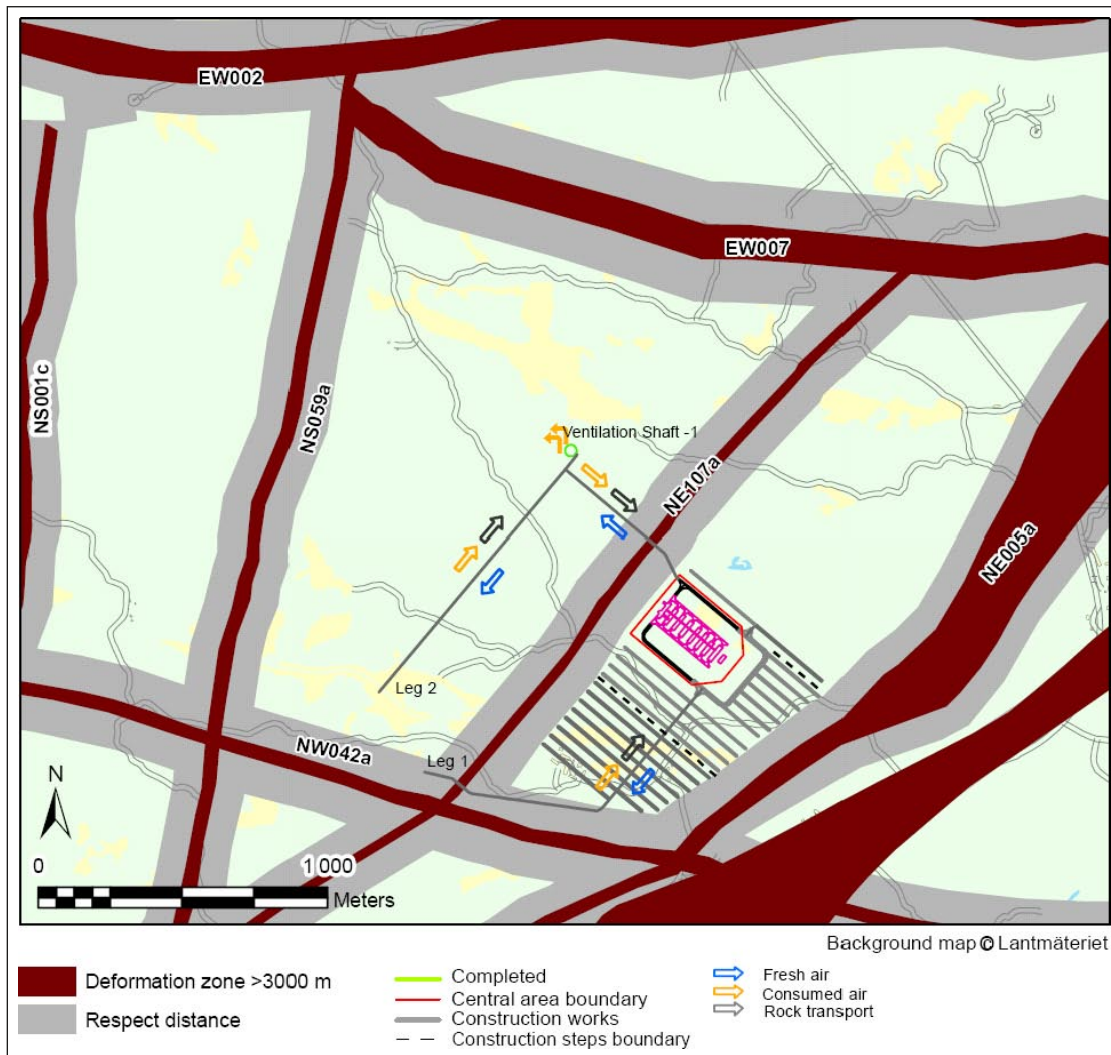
Development of deposition tunnels in the 1st and 2nd construction step.
